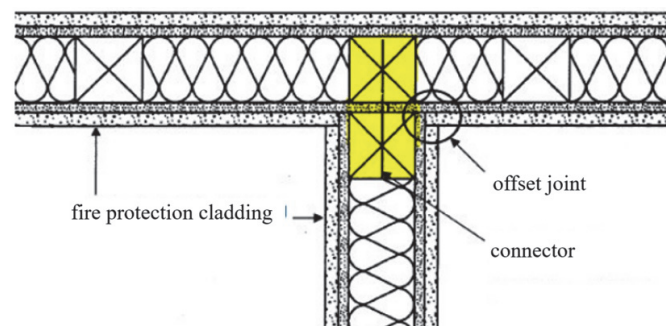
Connection of a load-bearing, room-separating wall to a continuous wall with an additional stud; fire protection cladding with staggered joints (horizontal section)
